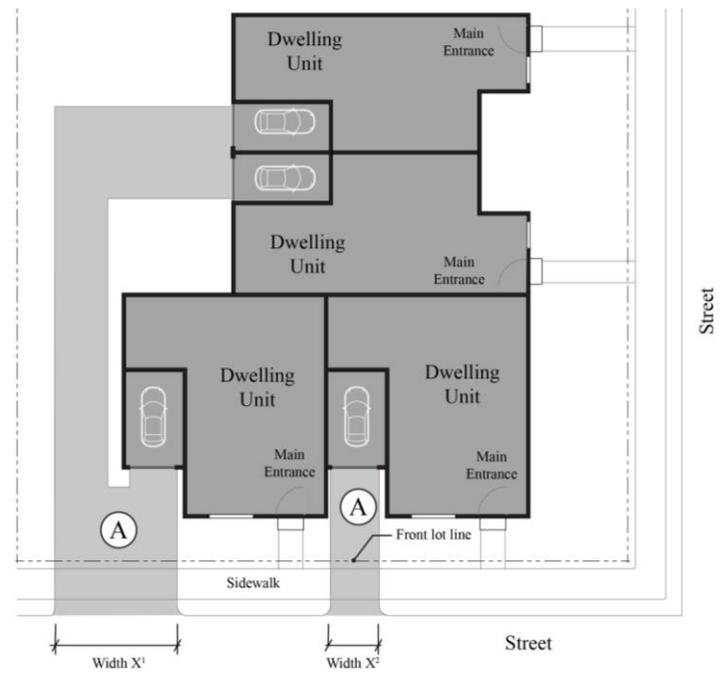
Triplex and Fourplex: Driveway Approach Options for Multiple Street Frontages
